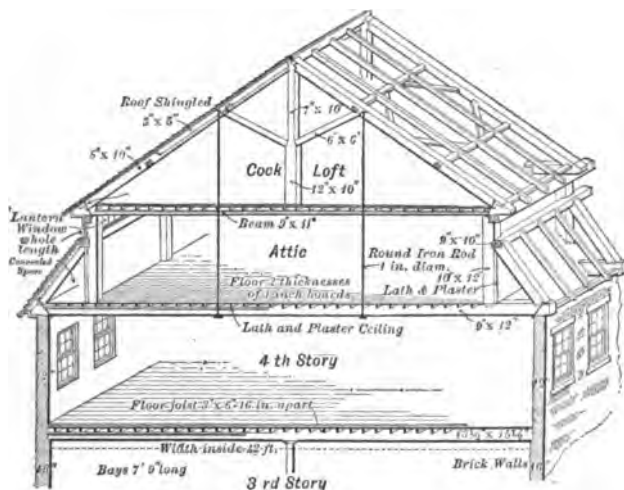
FRAMING OF OLD FACTORY ROOF.
